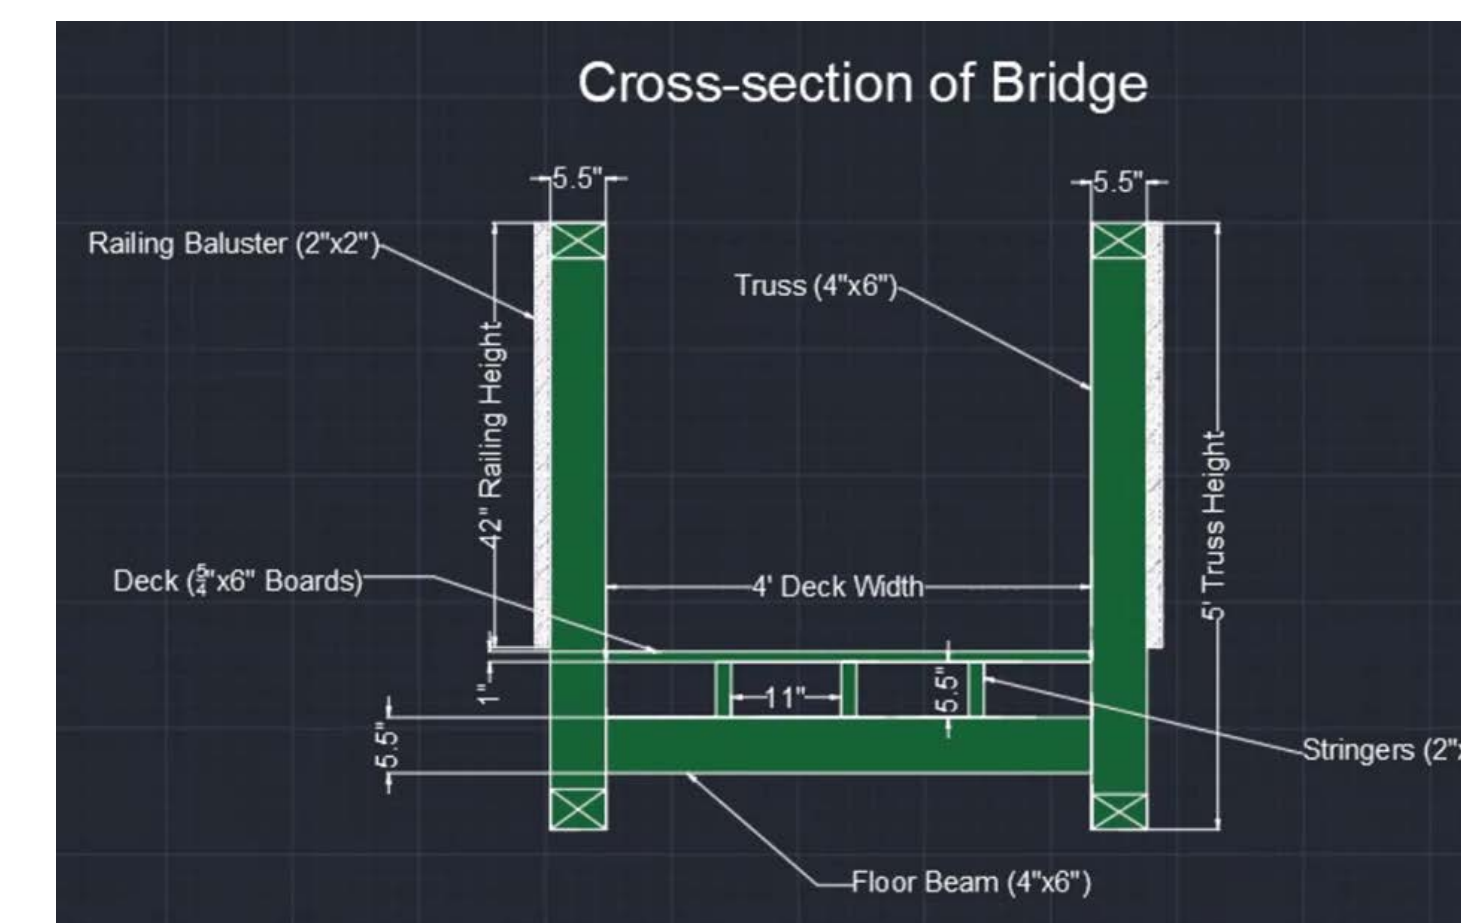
Shows the Cross-section of the bridge, including the trusses, floor beams, and decking (in green hatching)
